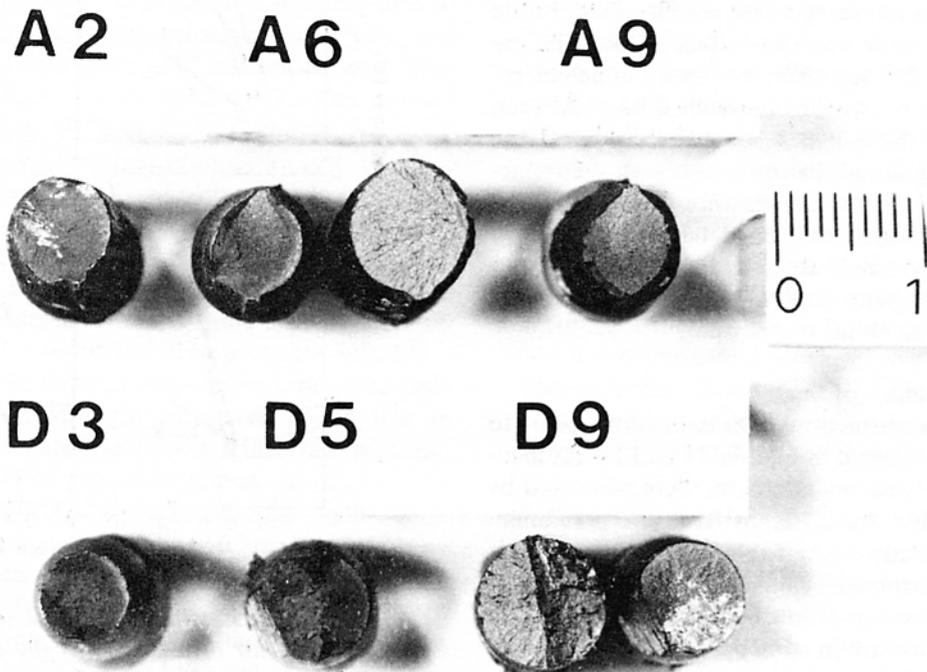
Failure surfaces of some rebars. A 1-cm scale is shown.
